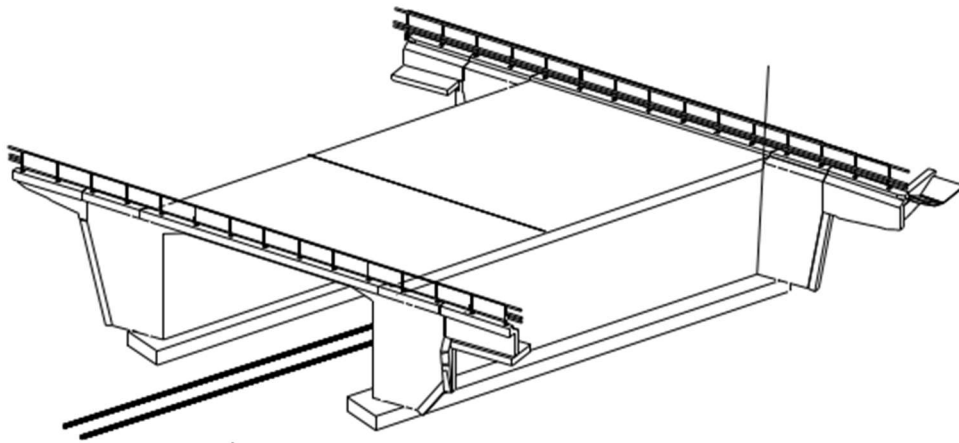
3D view of the bridge design (Ramboll, internal documents).
